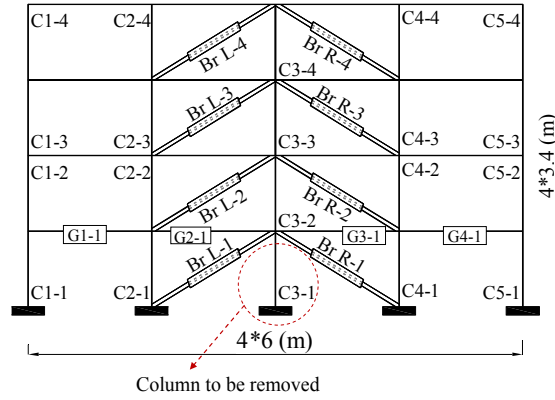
Structural Plane Frame with Inverted-V format of BRB Elements
